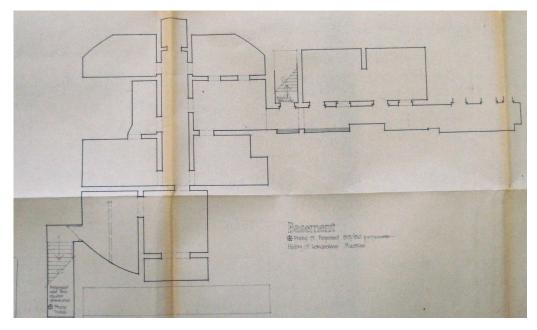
Plan of basement made during proposed conversion of Old Sessions House to Museum, 1982 (LRO LAU 6/4/11750)
